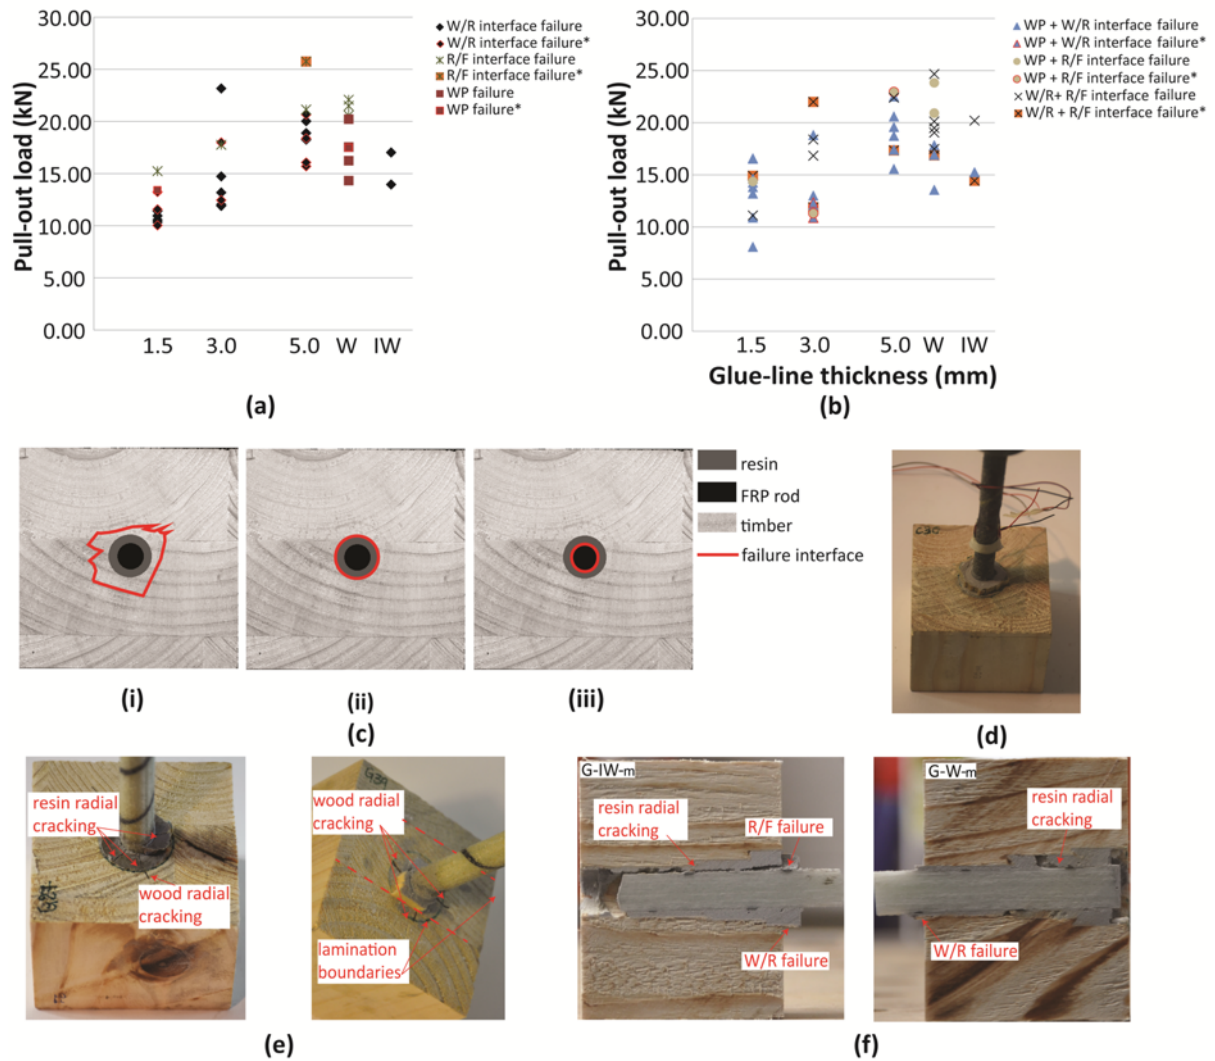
Pull out load versus glue-line thickness (a) clear bond failure modes and (b) mixed bond failure modes, (c) definition of bond failure modes (i) wood plug failure, (ii) wood/resin interface failure and (iii) resin/FRP failure, (d) actual photo of a typical wood/resin interface failure, (e) wood and resin radial cracking at failure and (f) typical crack path for the G-IW-m and G-W-m group.
